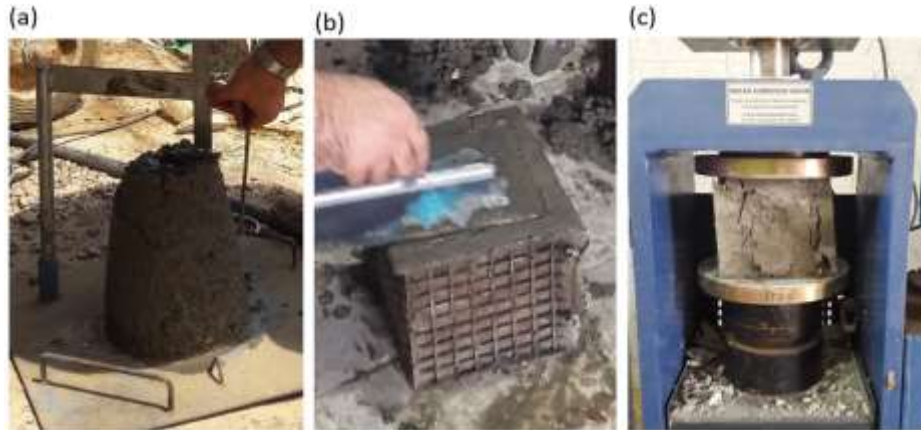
(a) Slump test setup, (b) Fabrication of specimens in cubic molds, and (c) A concrete specimen under fracture
